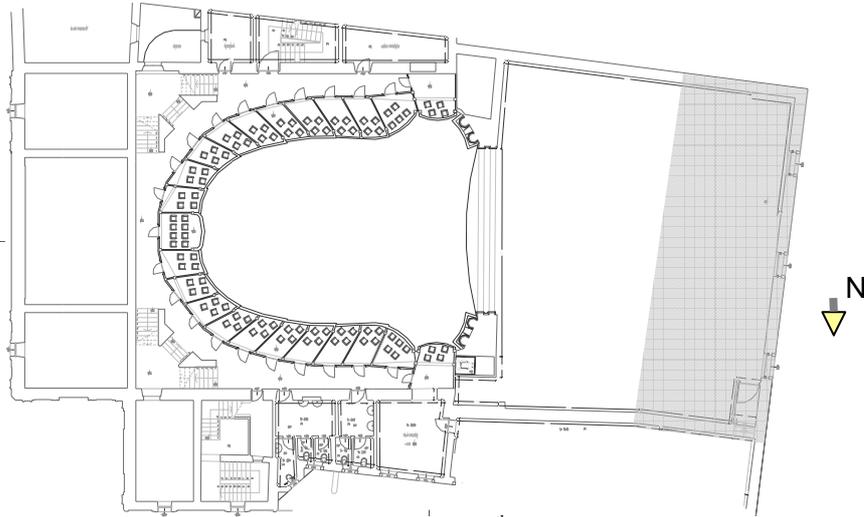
The floor plan of "Teatro Zandonai": the 18th century enlargement is highlighted.
